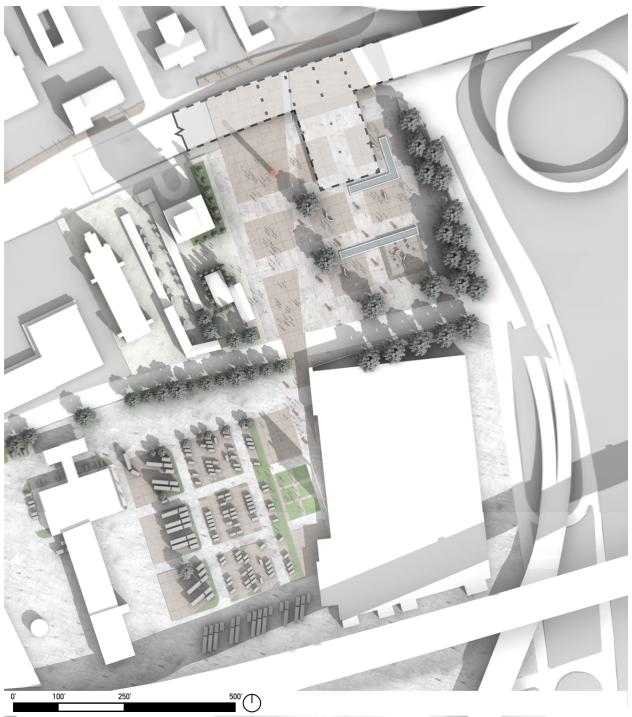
Travel Plaza and Sign Park Plan Source: Author
